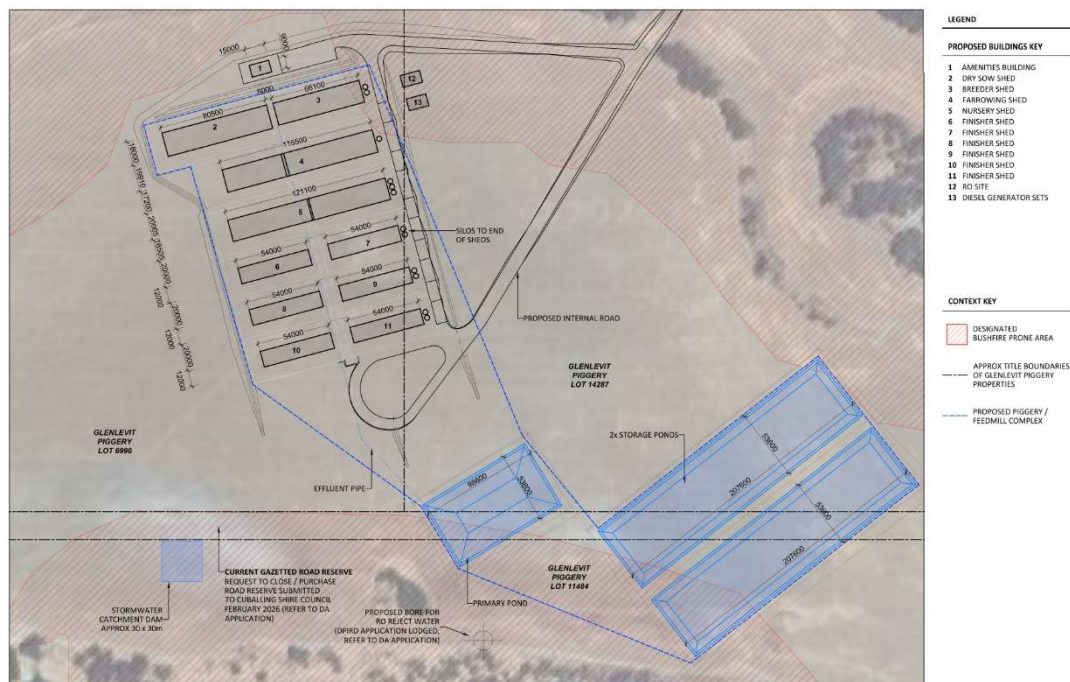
Proposed location of new piggery buildings and effluent ponds. Refer Drawing SCL25-23-DA04. Drawing not to scale.
